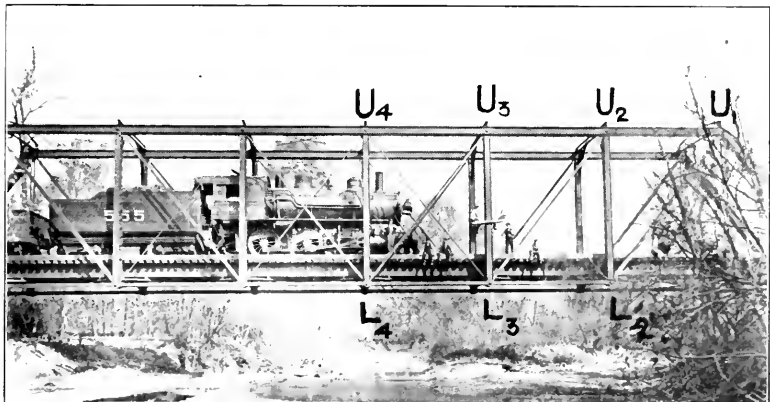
WHITE HEATH BRIDGE AND TEST TRAIN.
